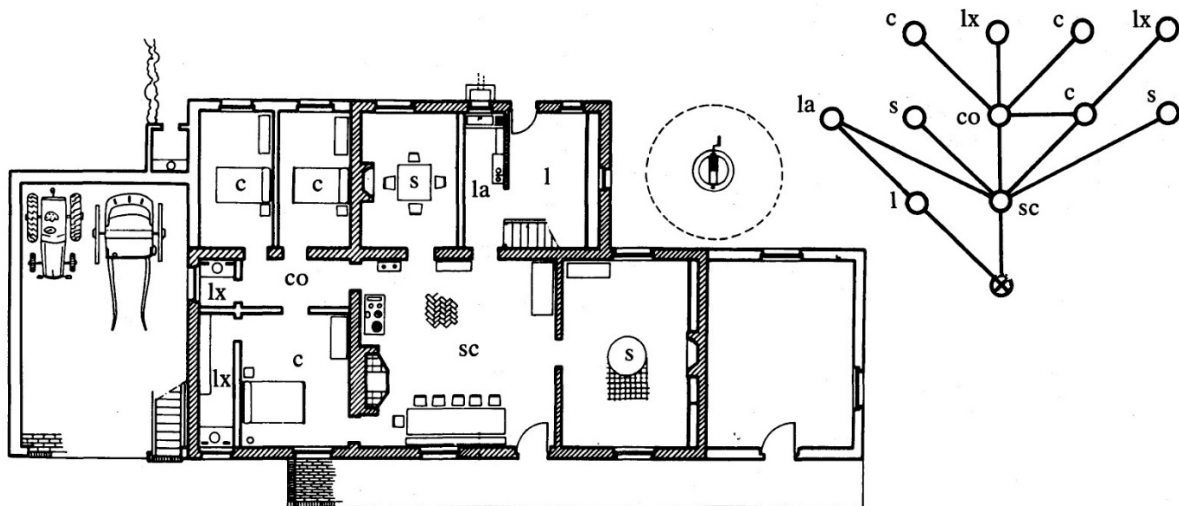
House plan and genotype graph of Le Cormier (Hillier et al., 1987)
